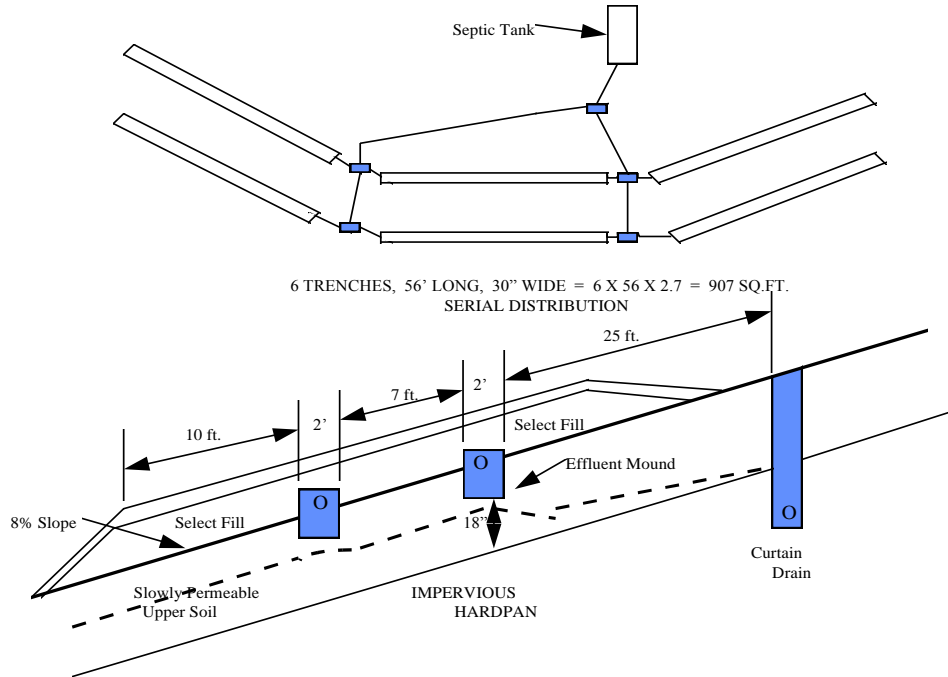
Trenches In Slowly Permeable Soil Spread On Slope
